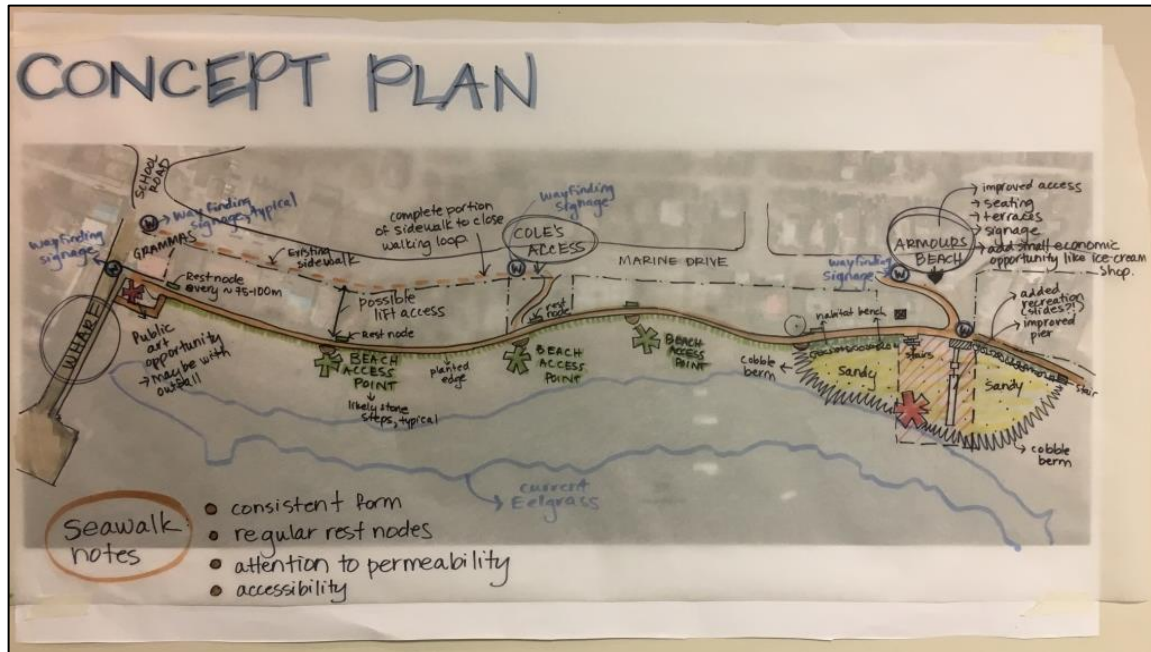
Mini-Charrette – Afternoon Session Concept Plan
